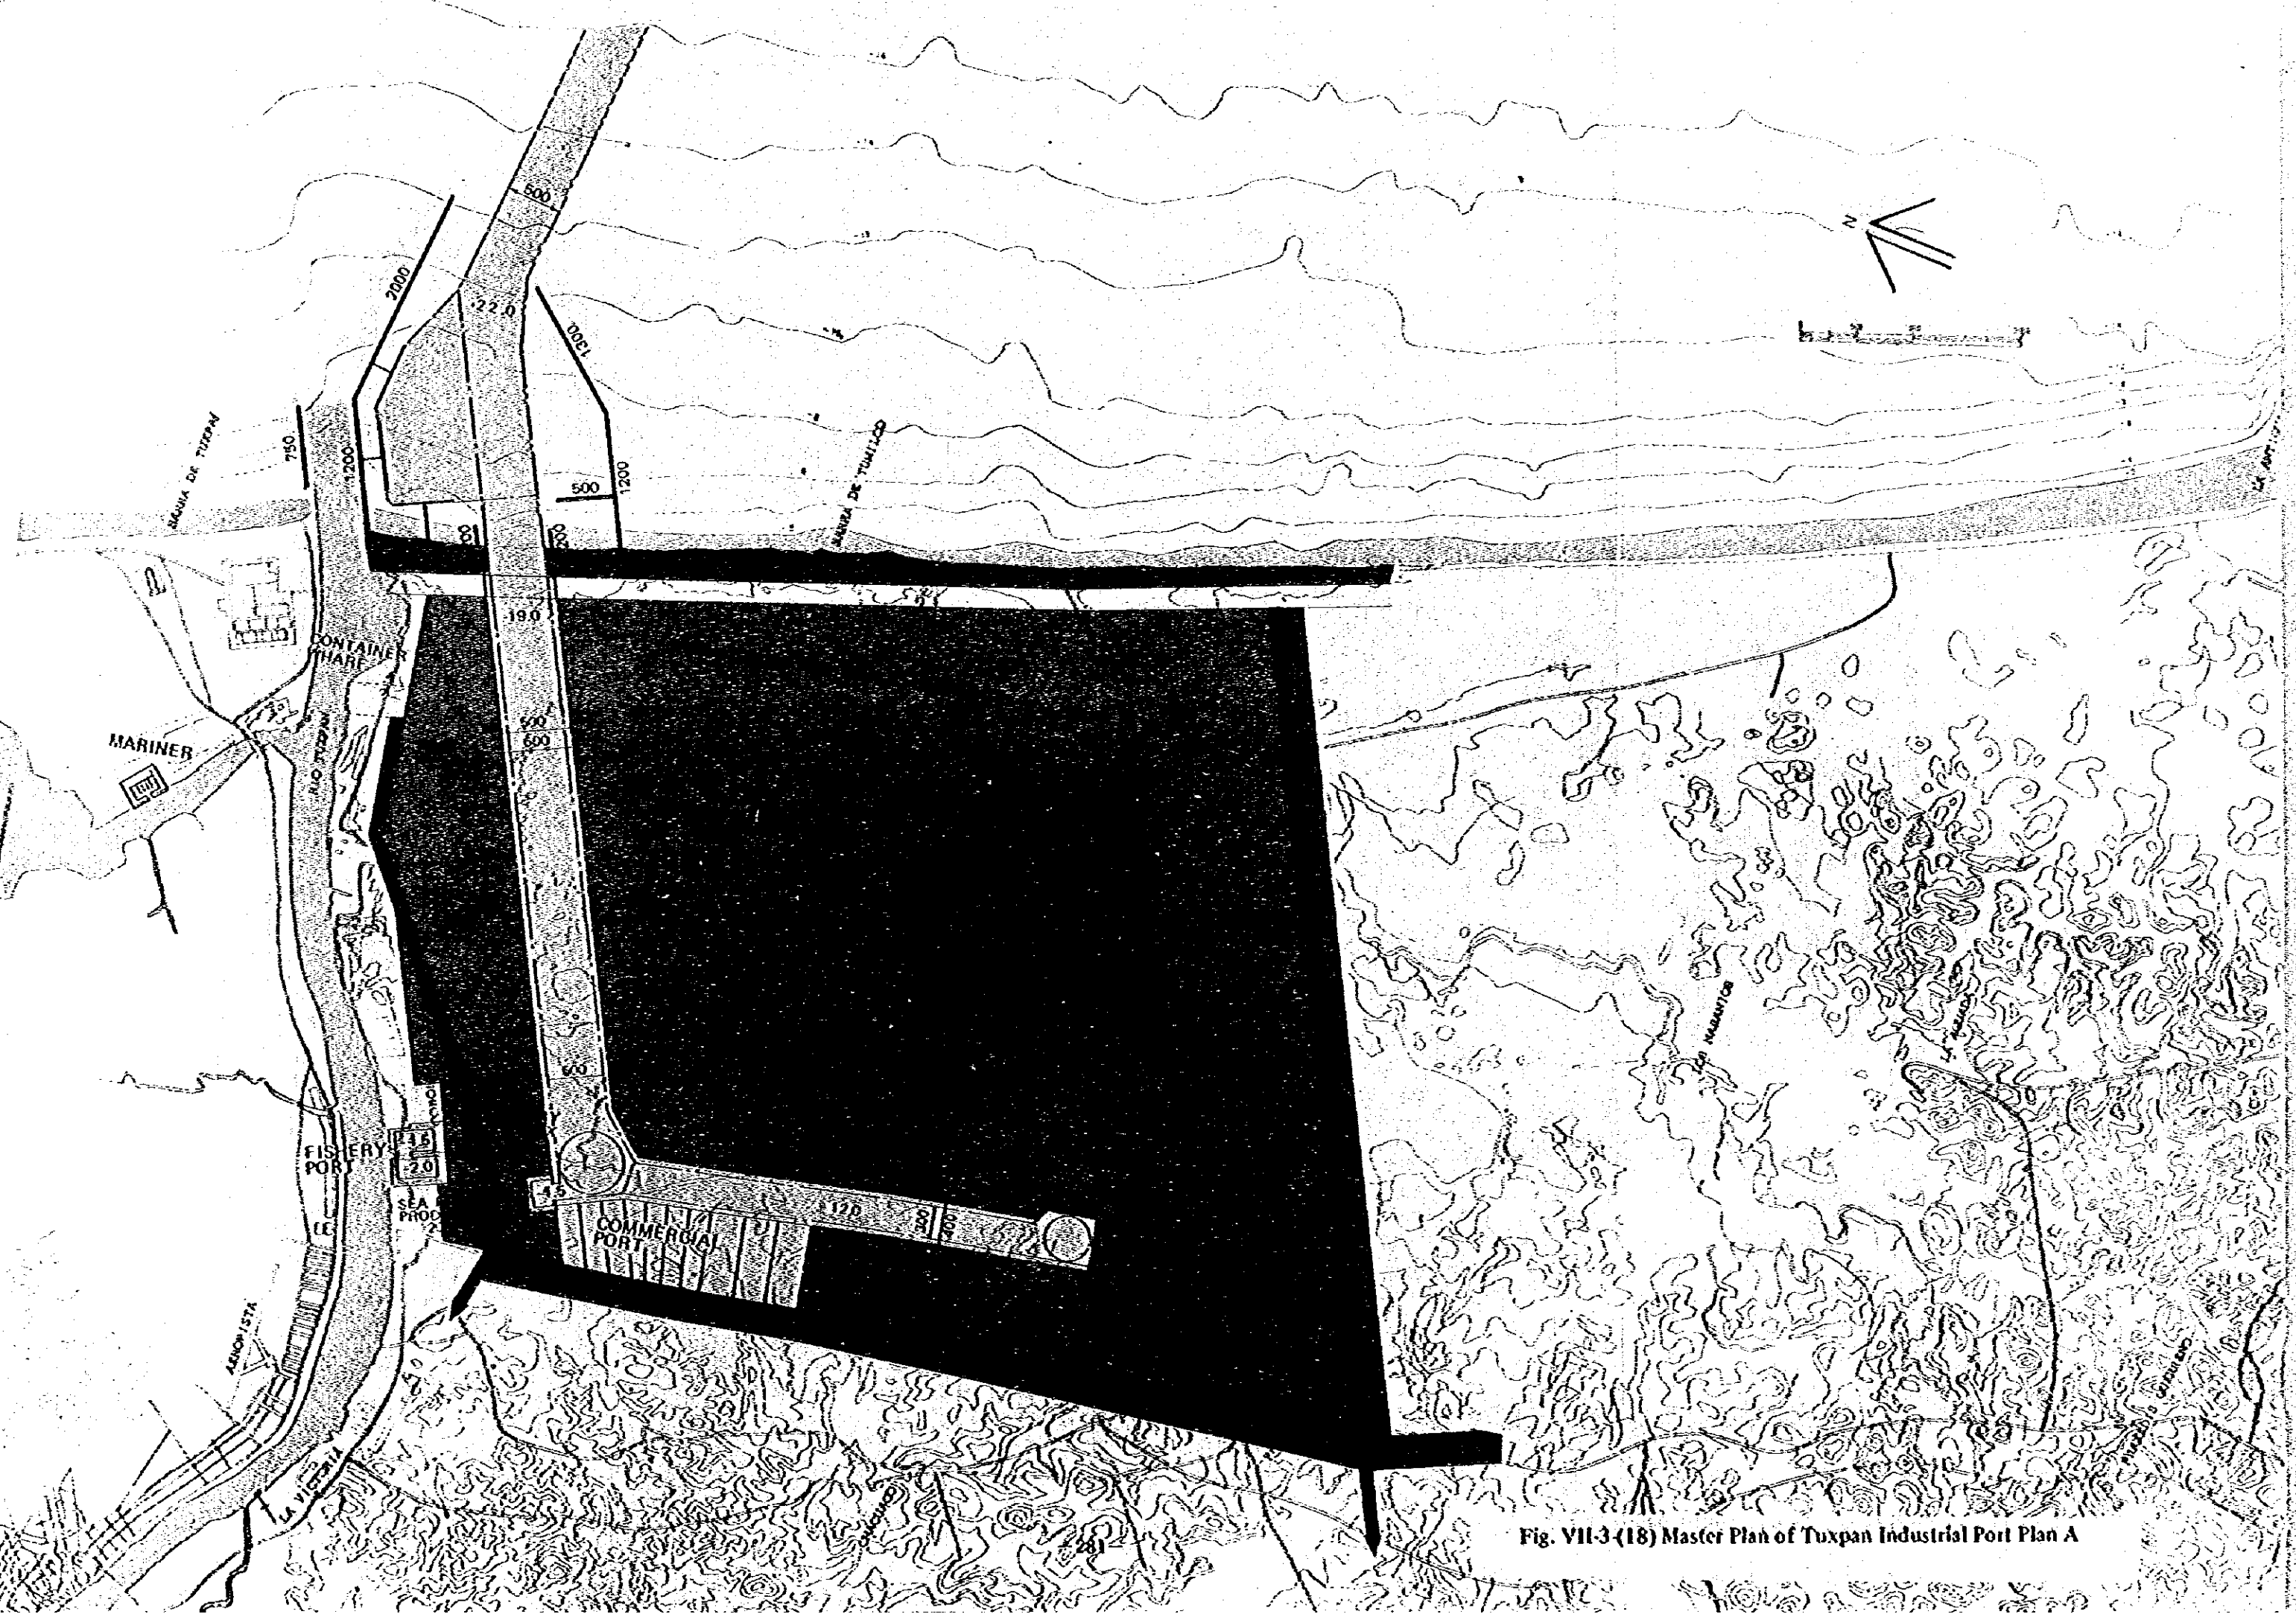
(18) Master Plan of Tuxpan Industrial Port Plan A
